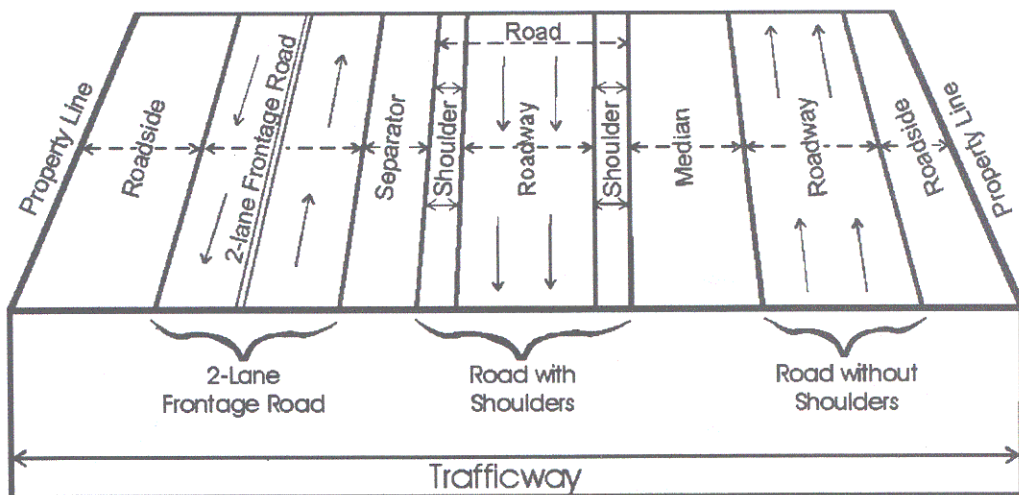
Trafficway with Frontage Road (See 2.2.30)
